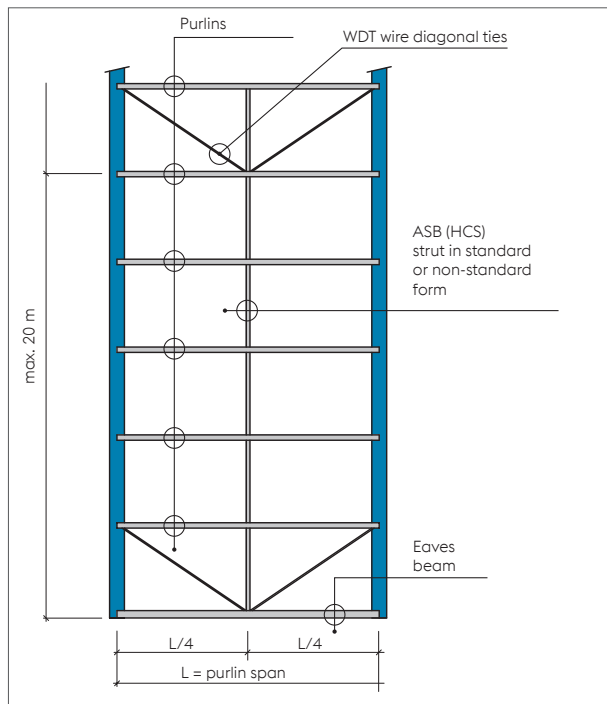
Bracing of purlins in duo-pitch or mono-pitch roofs featuring one row of struts
